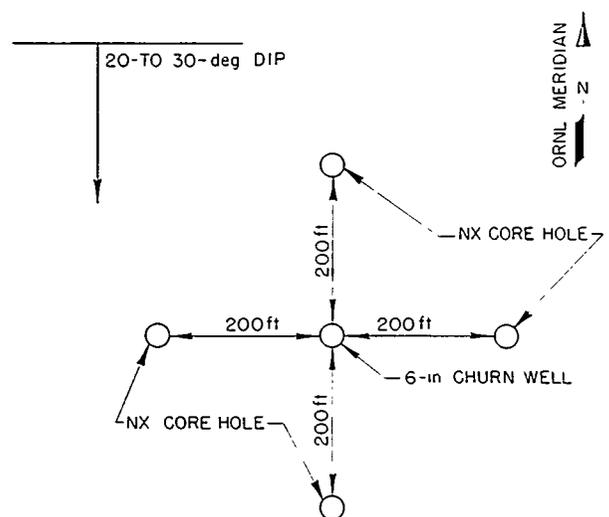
Layout of NX Core Hole and 6-in. Churn Well.
